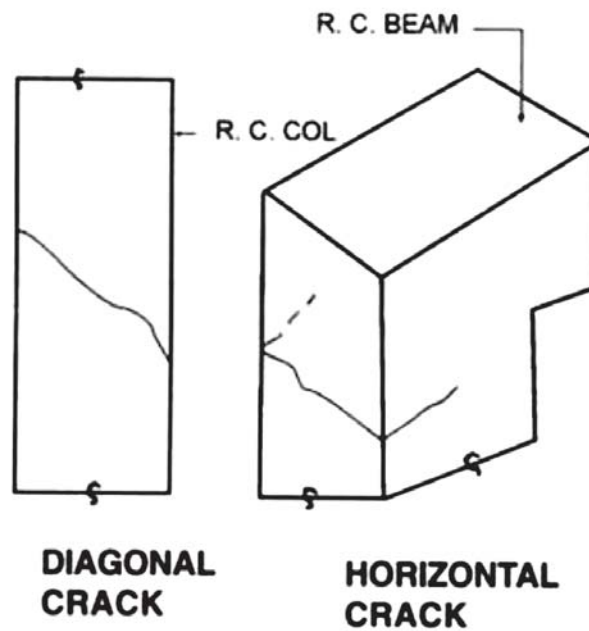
Sliding cracks (Ref : SP25 (S&T) 1984)
